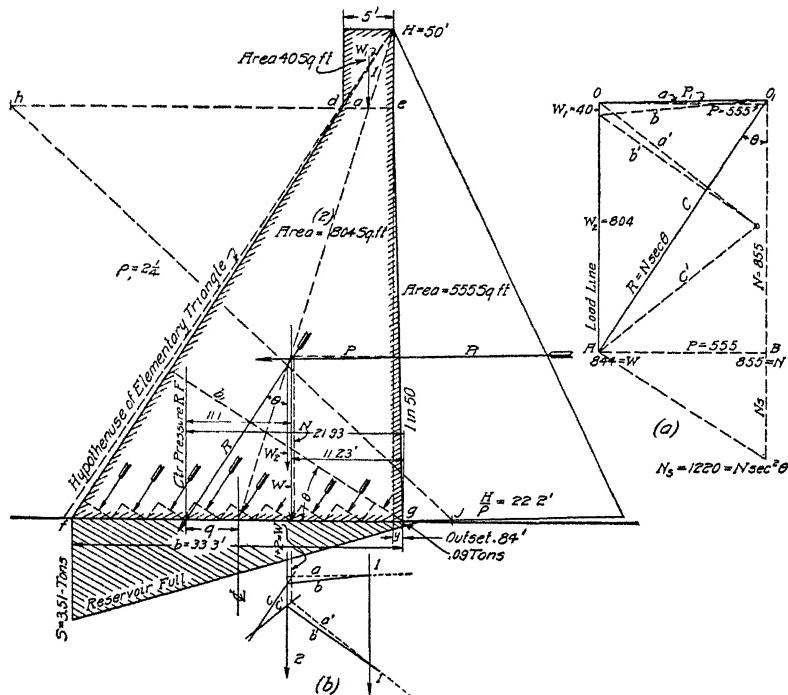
Diagram Showing Suitable Profile for 50-Foot Dam
